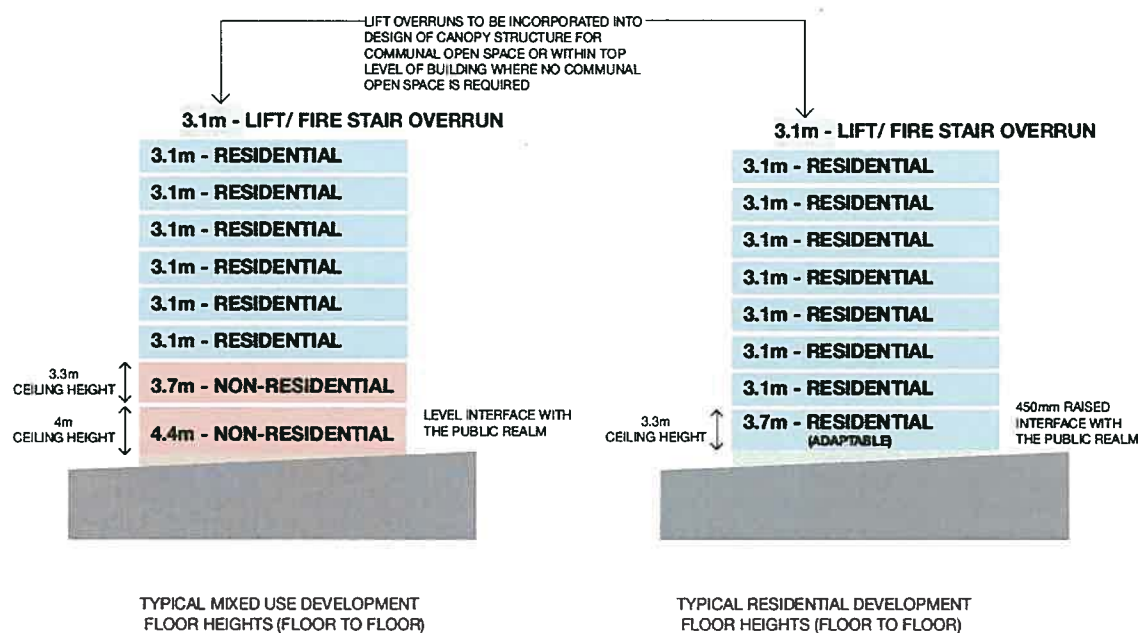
| Typical floor heights (floor to floor) of concept proposal showing adherence to the ADG requirements for ground and first floors (Source: Applicant's EIS)
